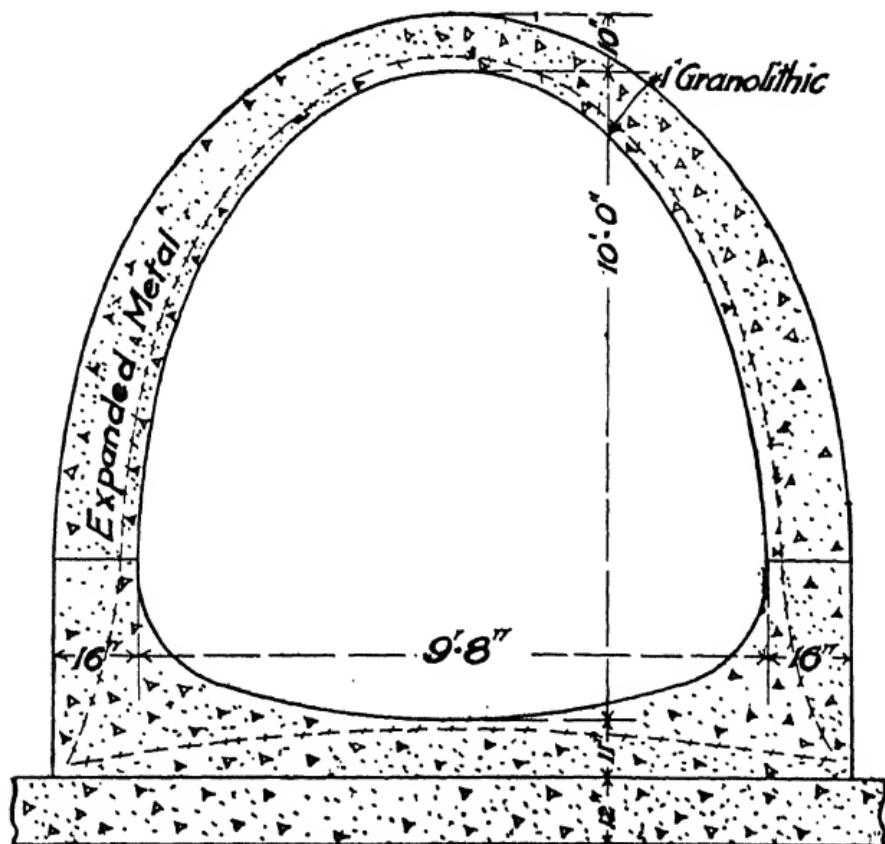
Reinforced Concrete Conduit, Torresdale, Philadelphia.
